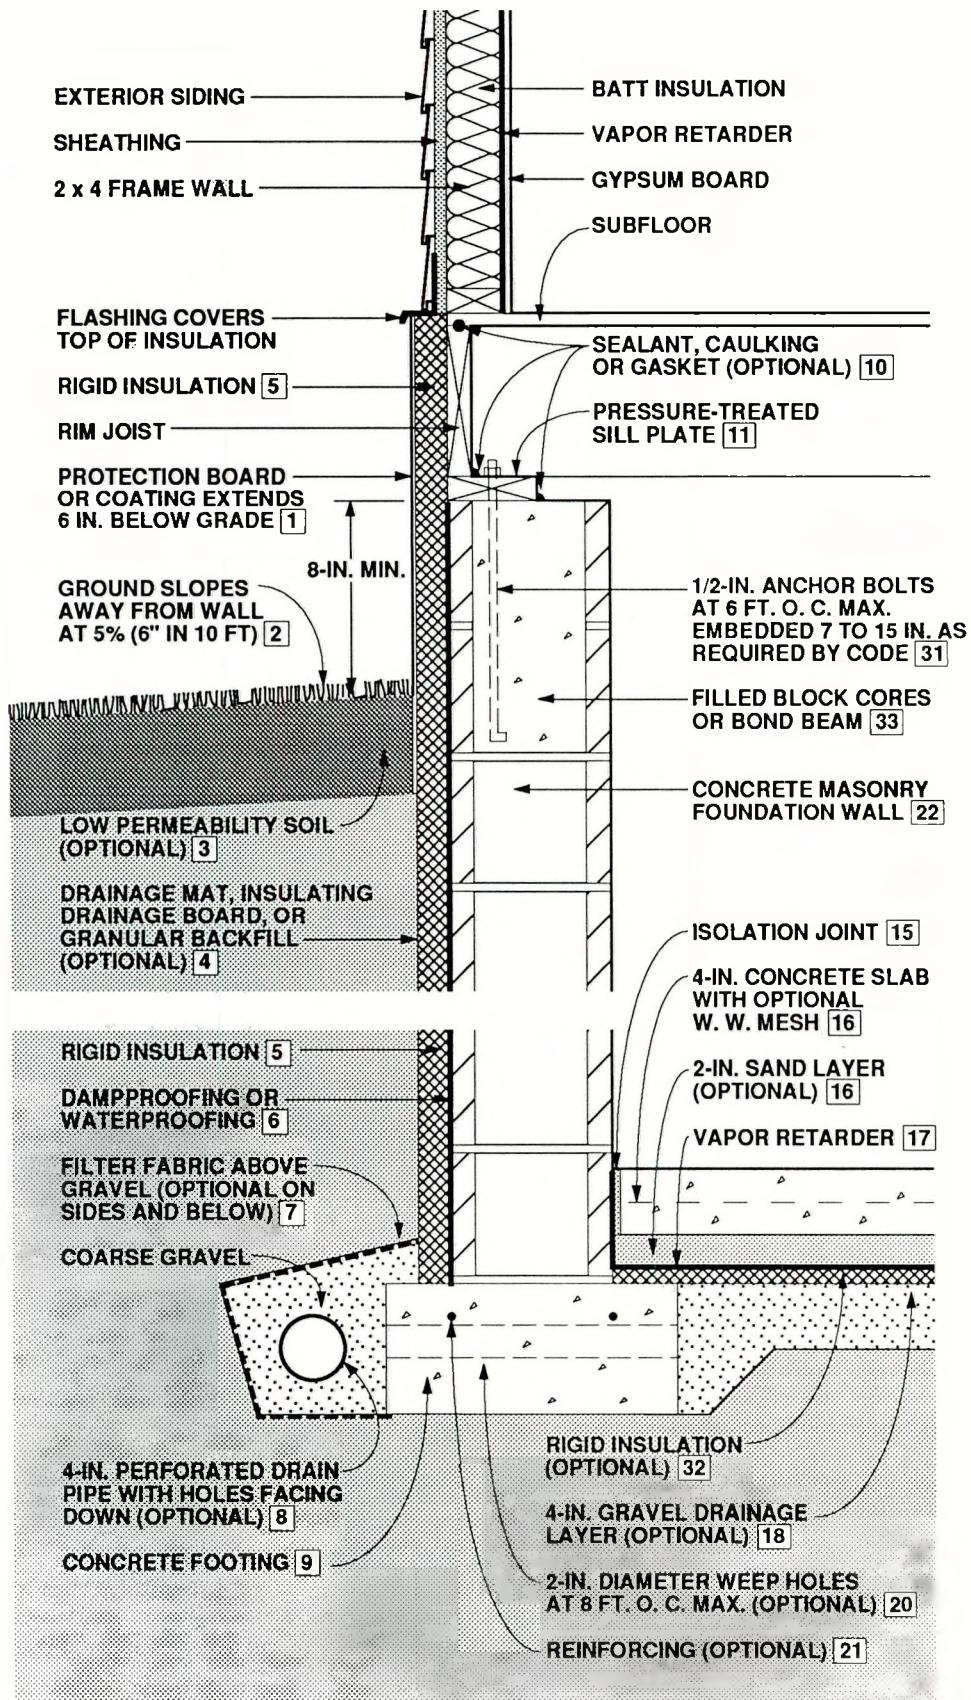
Masonry Basement Wall with Exterior Insulation
